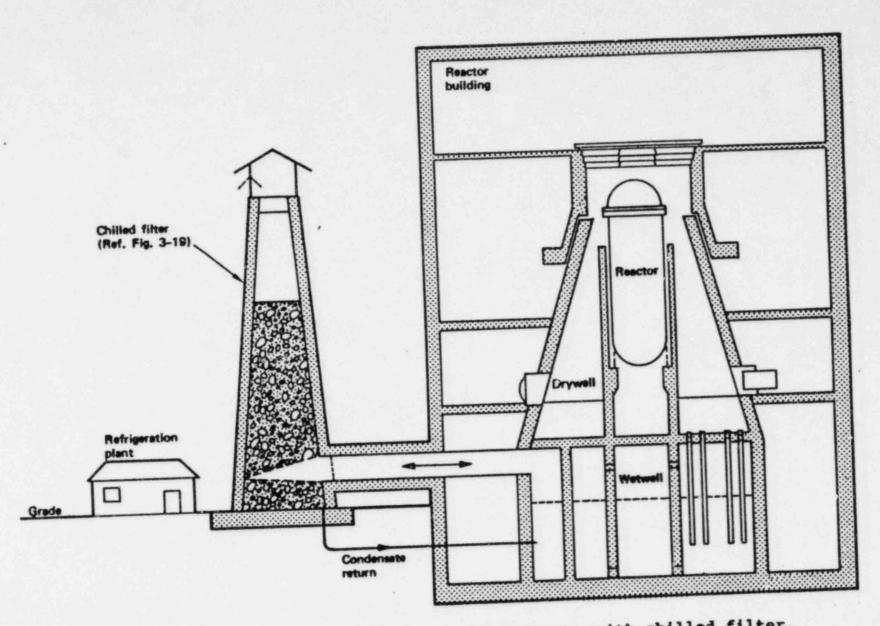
Schematic - open Mark II containment with chilled filter.
